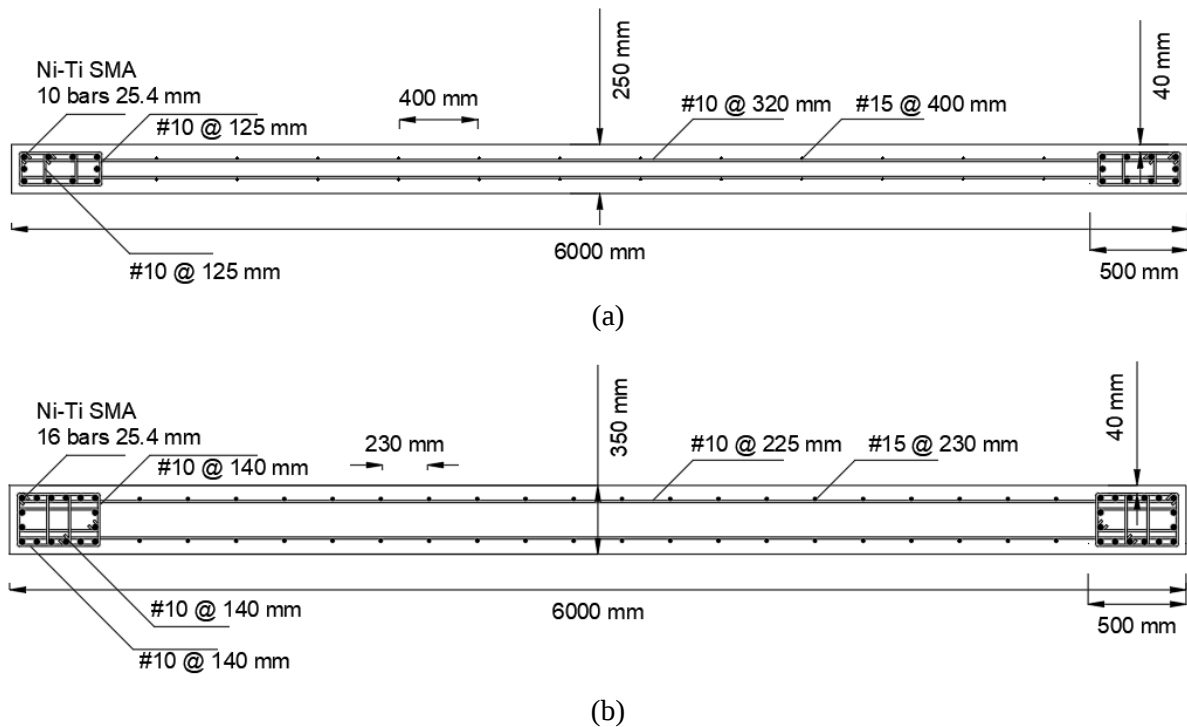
Section 1-1 of hybrid SMA-steel reinforced concrete shear walls: (a) Wall MDHW and (b) Wall DHW
